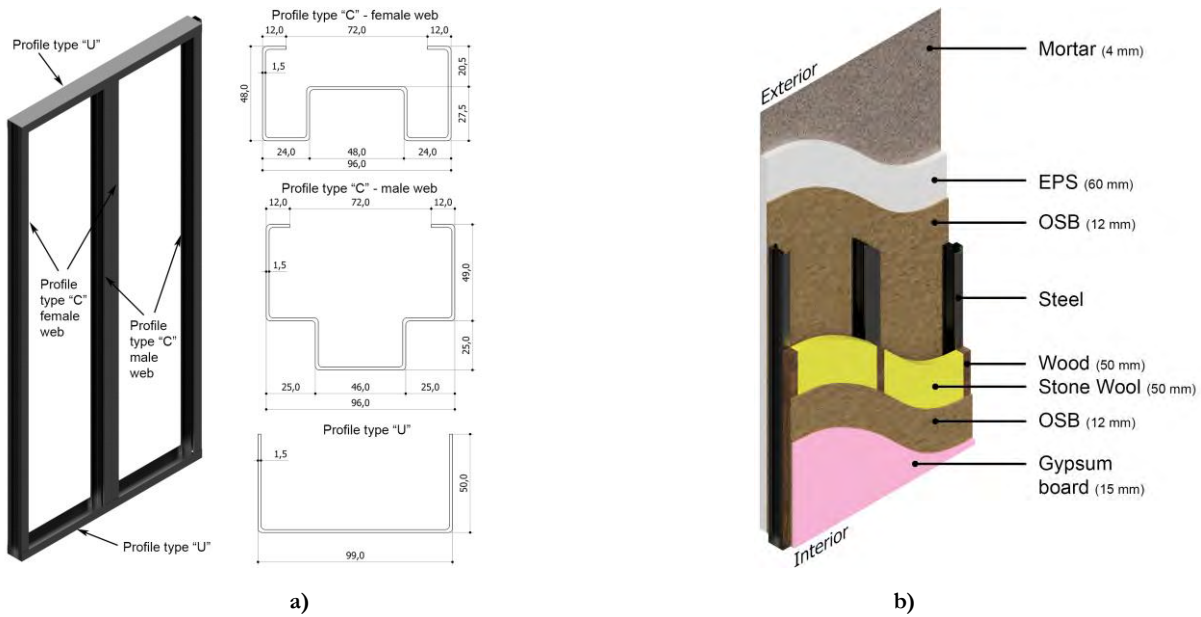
Wall module with LSF structure: a) steel profiles; b) wall composition.
